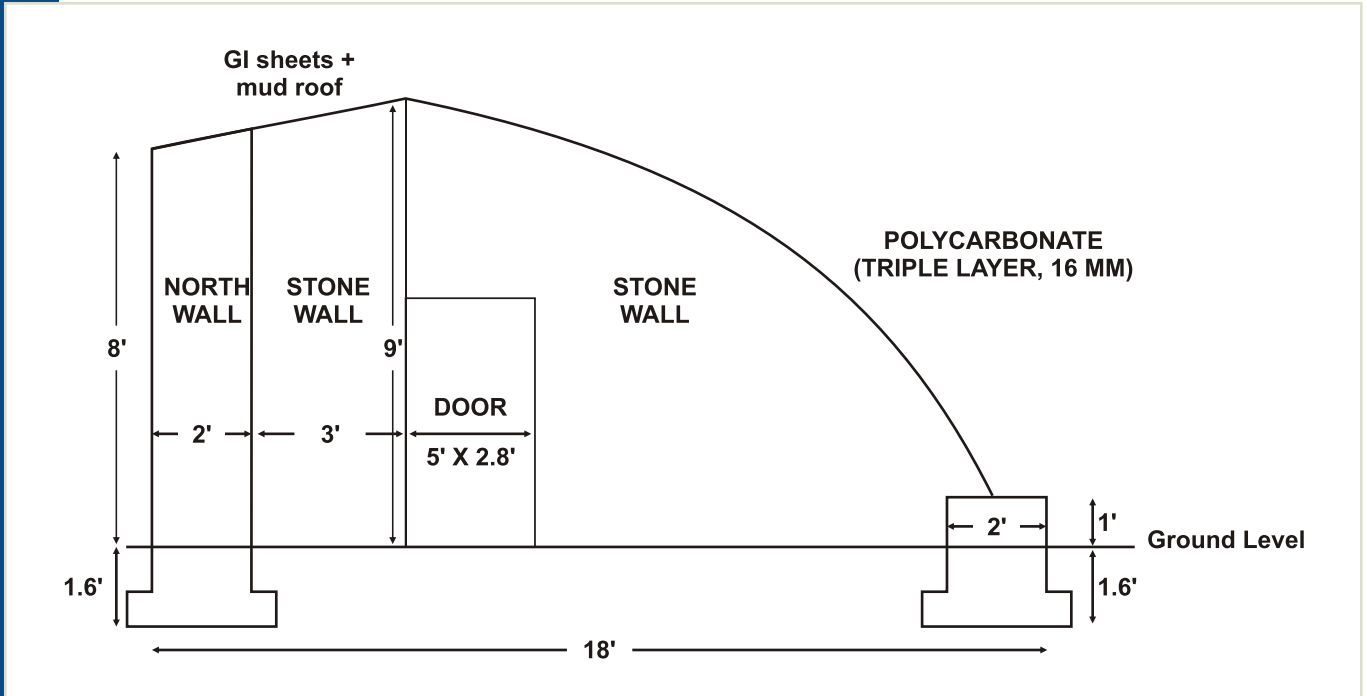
(b): Side view (West) of Domestic Type Ladakh Greenhouse (32'×18'; single stone wall)
